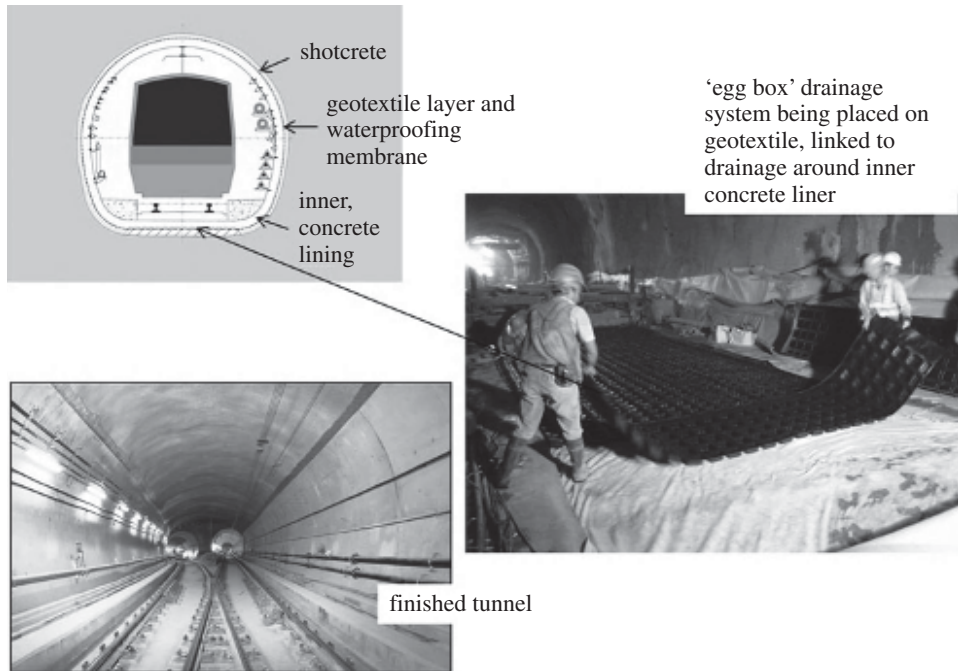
Egg box drainage system for a drained tunnel (courtesy of MTRC, Hong Kong).
